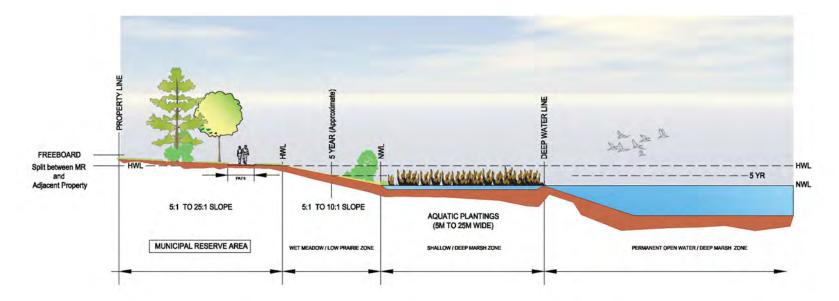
Constructed Wetlands Complex/Stormwater Facility Plan
